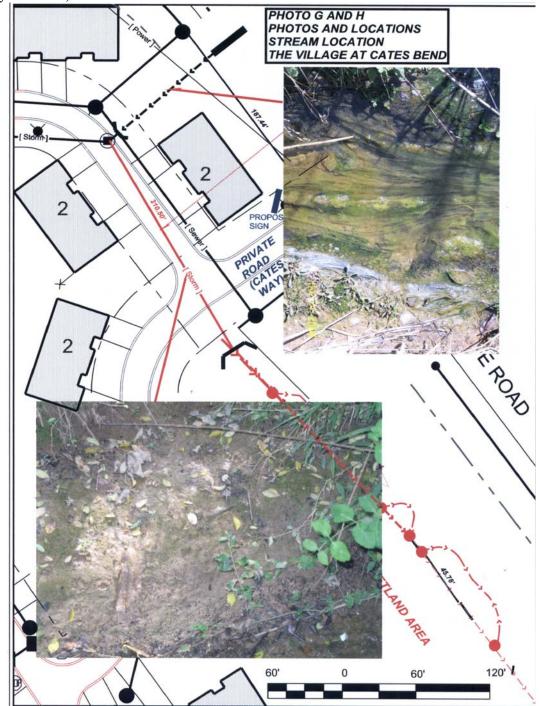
Photo of top channel to remain in place, and portion of channel to be culverted.
